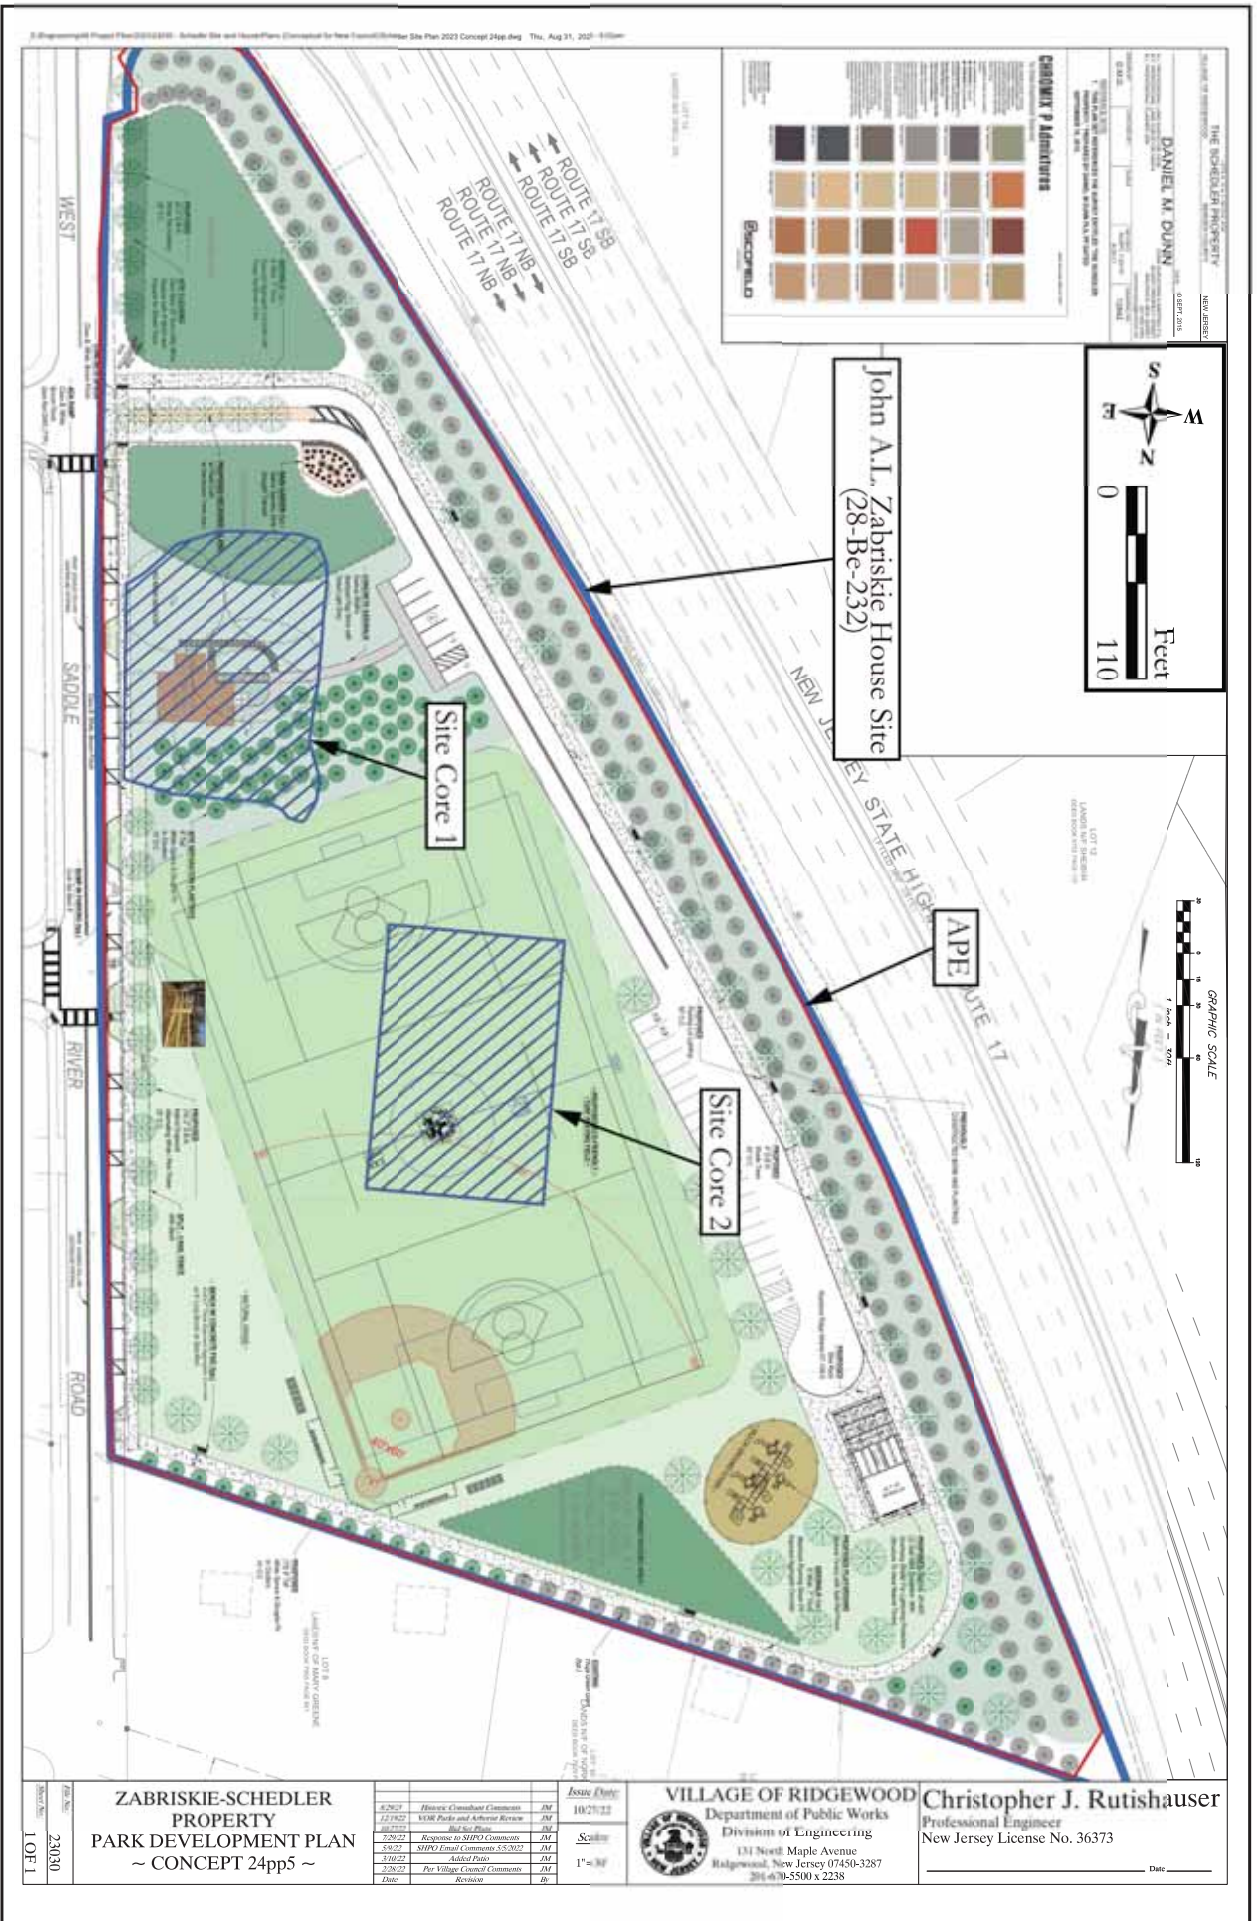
Zabriskie-Schedler Property Park Development Plan showing the John A.L. Zabriskie House Site (28-Be-232).
